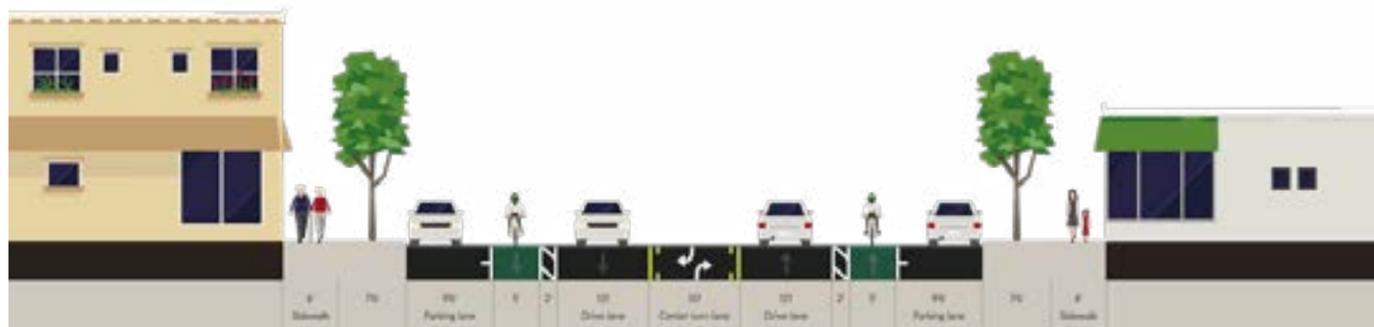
Potential North Main (north of Broadacre) Complete Streets Improvement
